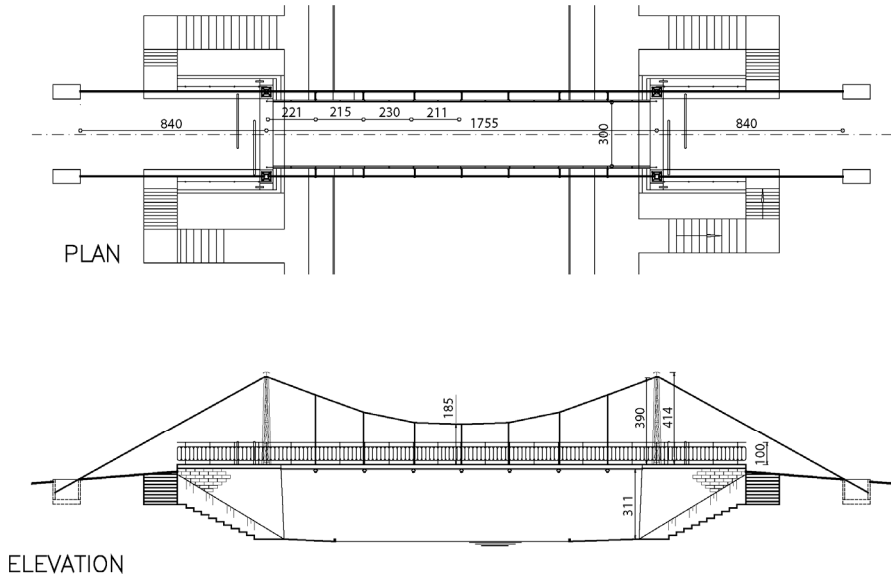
Plan and elevation. Iron suspension bridge in the public park of Vilvoorde, 1899.
